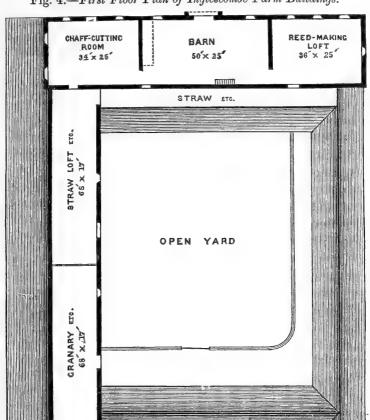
First Floor Plan of Inglescombe Farm Buildings.
